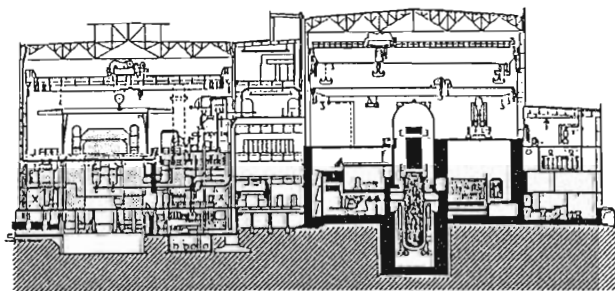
Sectional Drawing of WWER-440/W-230¹⁴⁾
